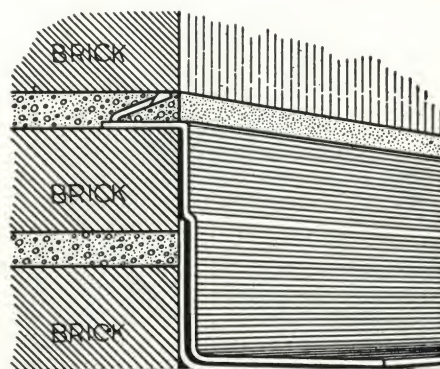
Point up raggle with a rich mixture of portland cement mortar, or asphalt roof cement. In using asphalt roof cement stiffen with portland cement to form a mastic consistency. Then apply a coating of bituminous cement over entire exterior of flashing
